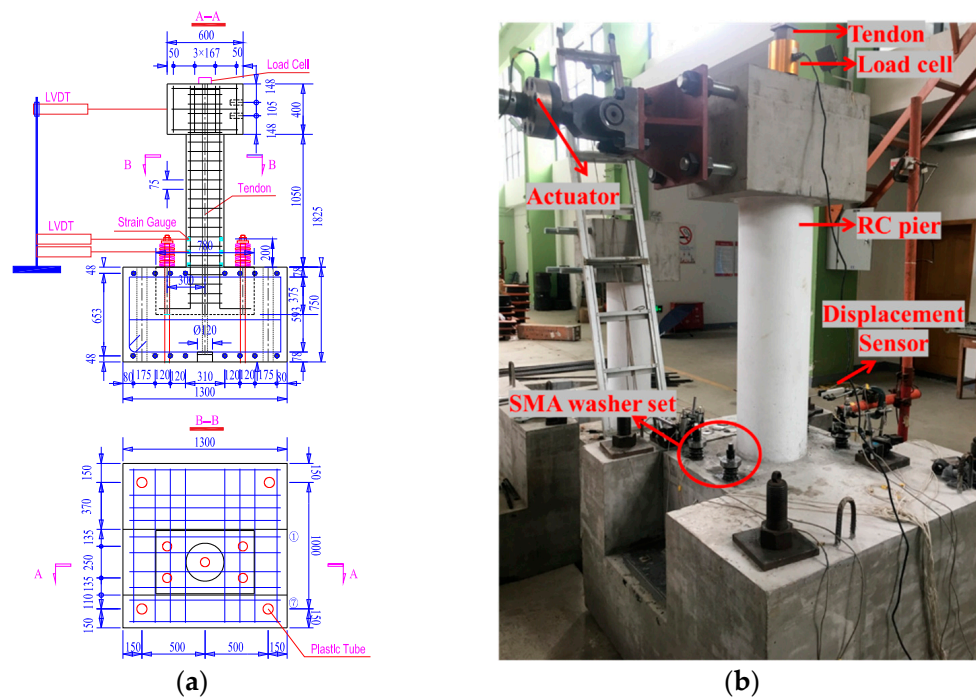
Test of the SCR pier: (a) drawing of the SCR pier specimen, (b) photo of the test setup.
